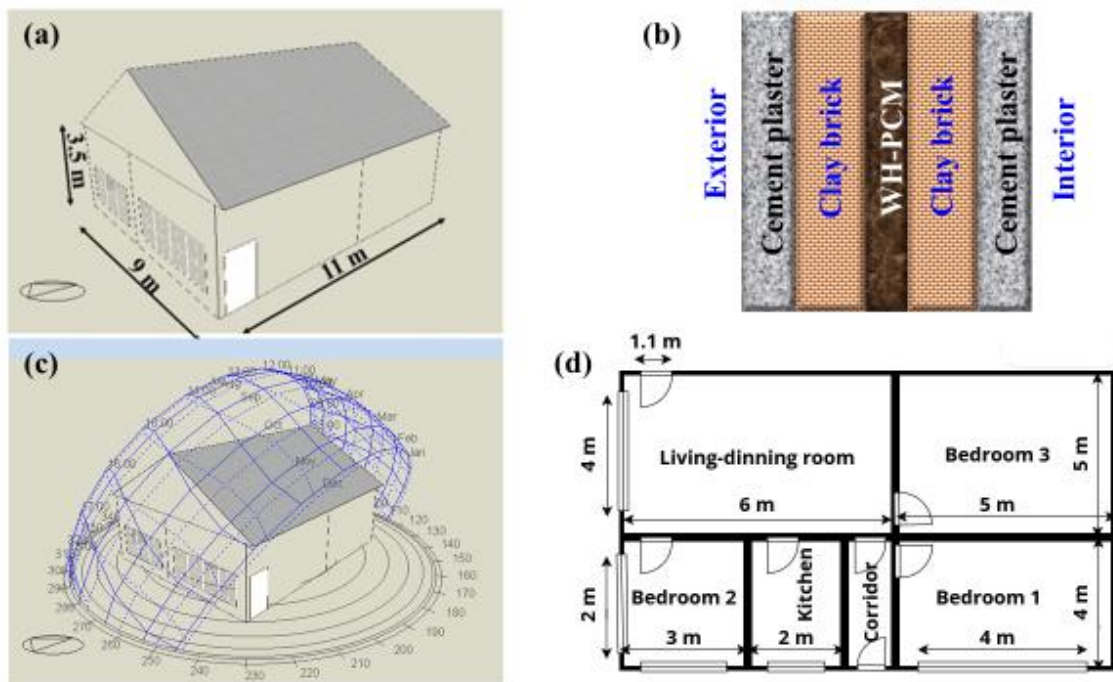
(a) Building model, (b) WH-PCM position on wall, (c) Sun path diagram for the building model, (d) Detailed floor plan of the building model
